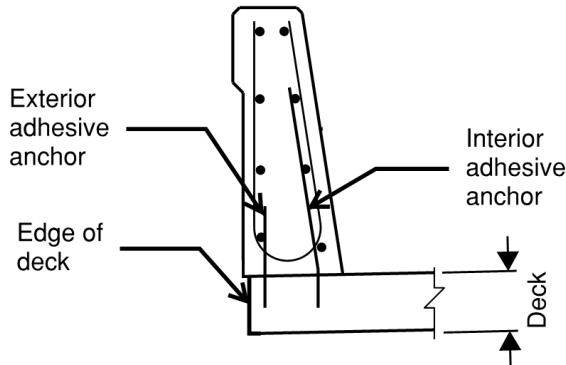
Example of adhesive anchors used in a concrete parapet on a bridge deck.
